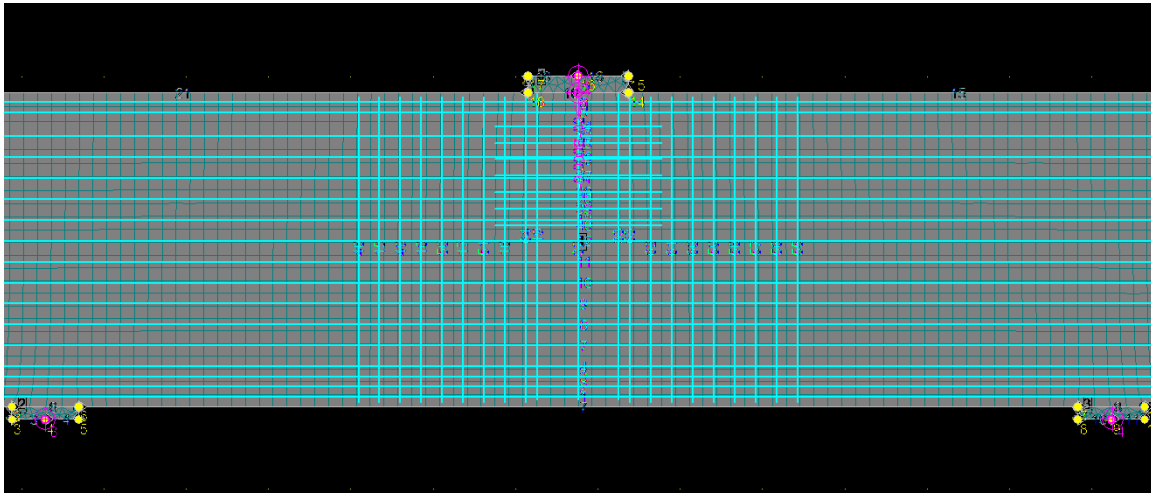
Deep beam with $a/d=1.85$ and vertical reinforcement placed close to loading plate
